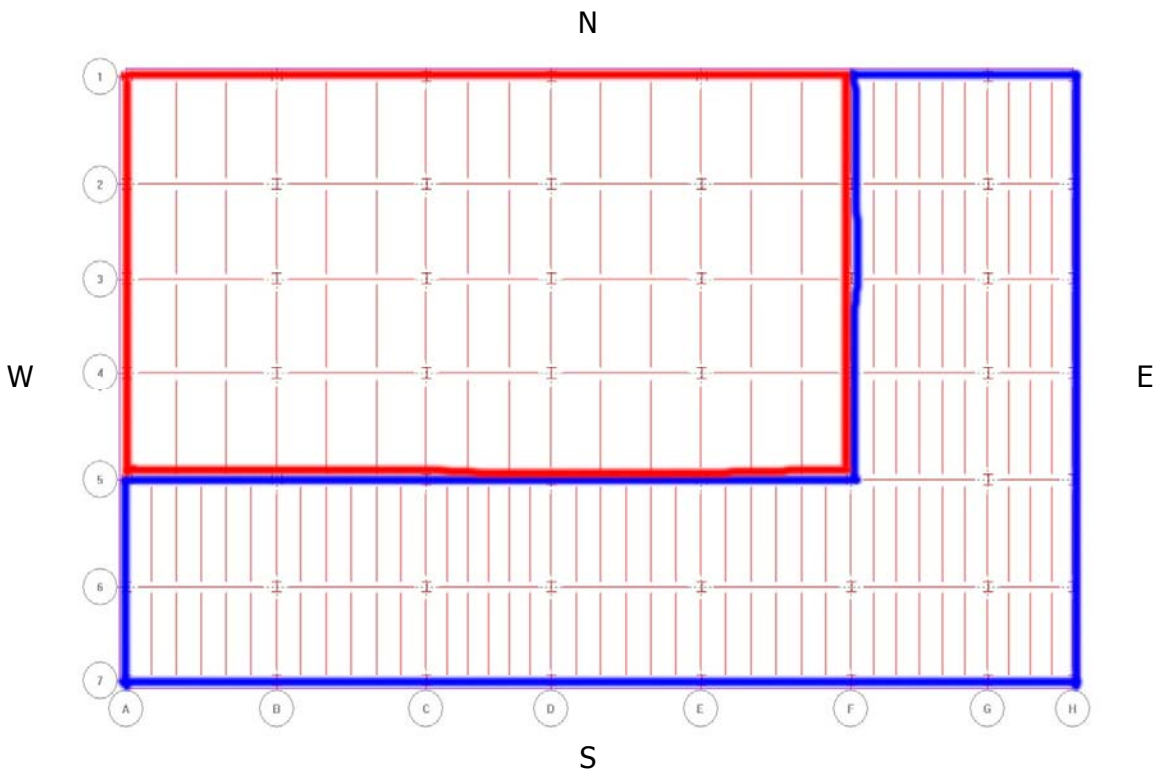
Basic Layout of First Floor; Office Building = Red, Driveway = Blue
